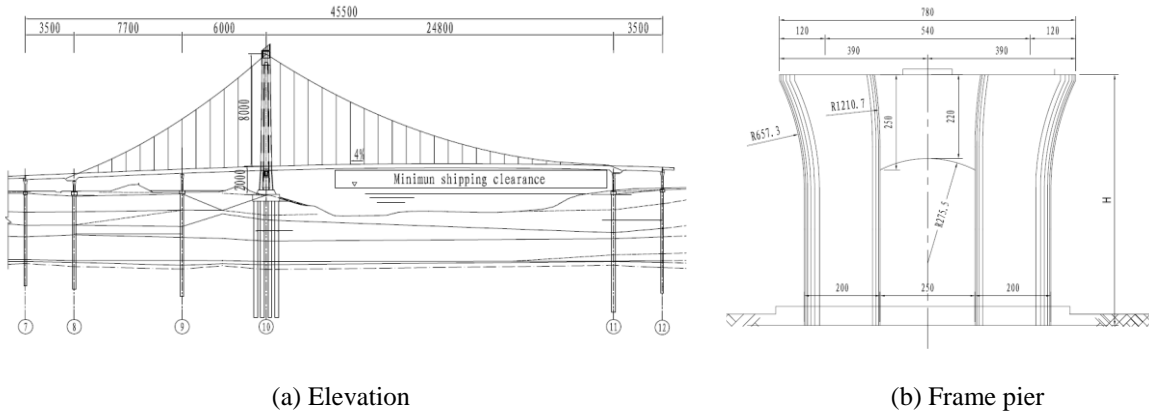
Elevation of the Nanjing Jia River Bridge (unit: cm)
